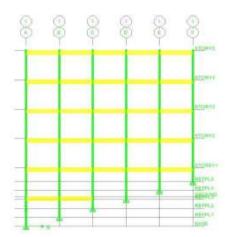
Elevation of step back building for five storey model (150 slope)
